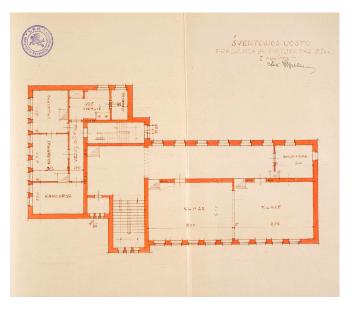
Second floor plan of 2-class primary school building in Šventoji (civ. eng. Feliksas Bielinskis, 1937) [drawing from LCVA].
